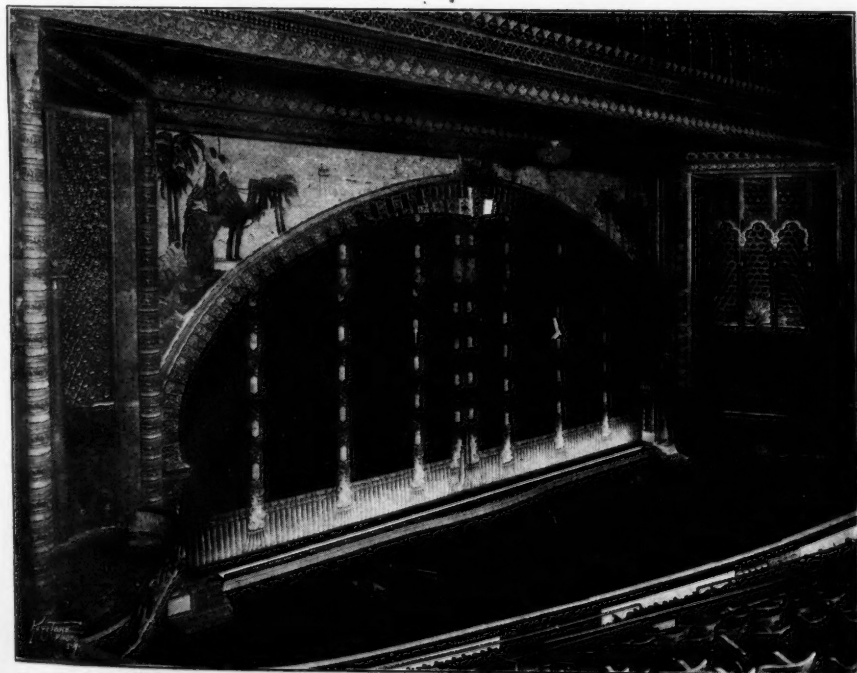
PROSCENIUM ARCH, 100-FOOT CLEAR SPAN. ASBESTOS CURTAIN AND LOUD SPEAKER HORNS ARE CONCEALED WITHIN THE JEWELLED CROWN OF ARCH.
